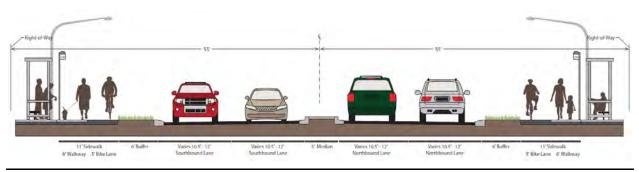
Proposed Typical Section – NE Riddell Road to NE McWilliams Road
